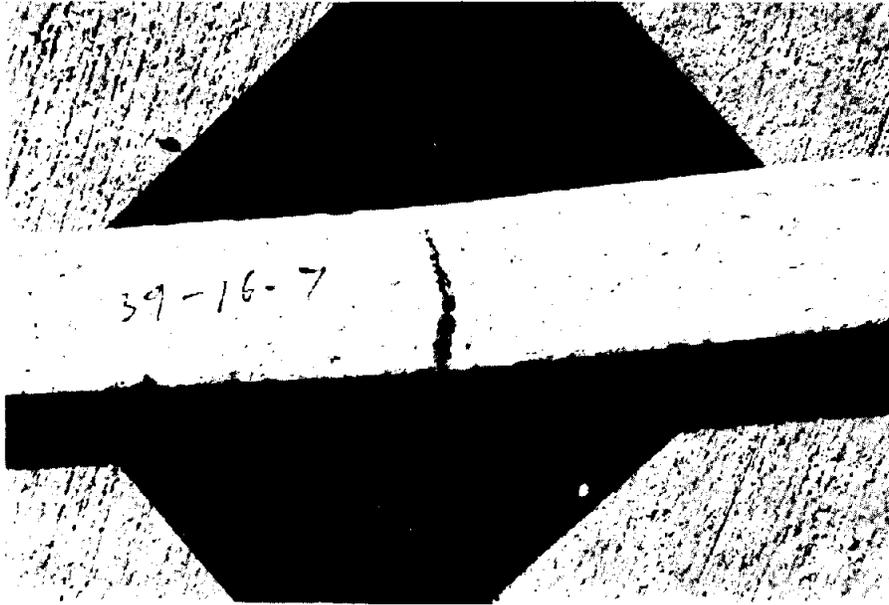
FAILURE MODE OF FIBROUS BEAMS
